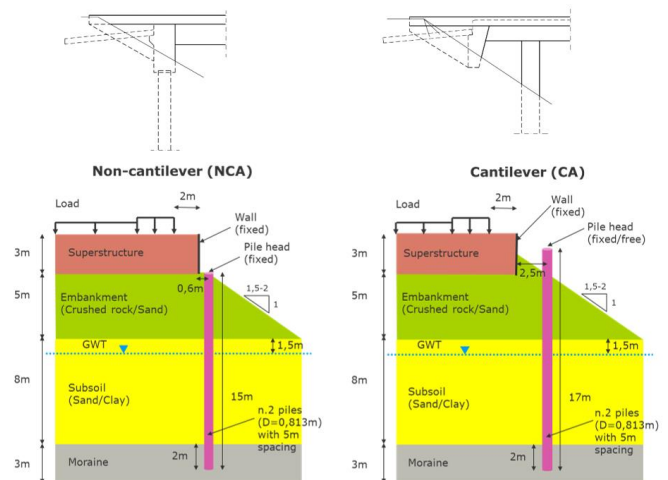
Schematization of NCA and CA bridge abutments with piles used in this study (not in scale).
